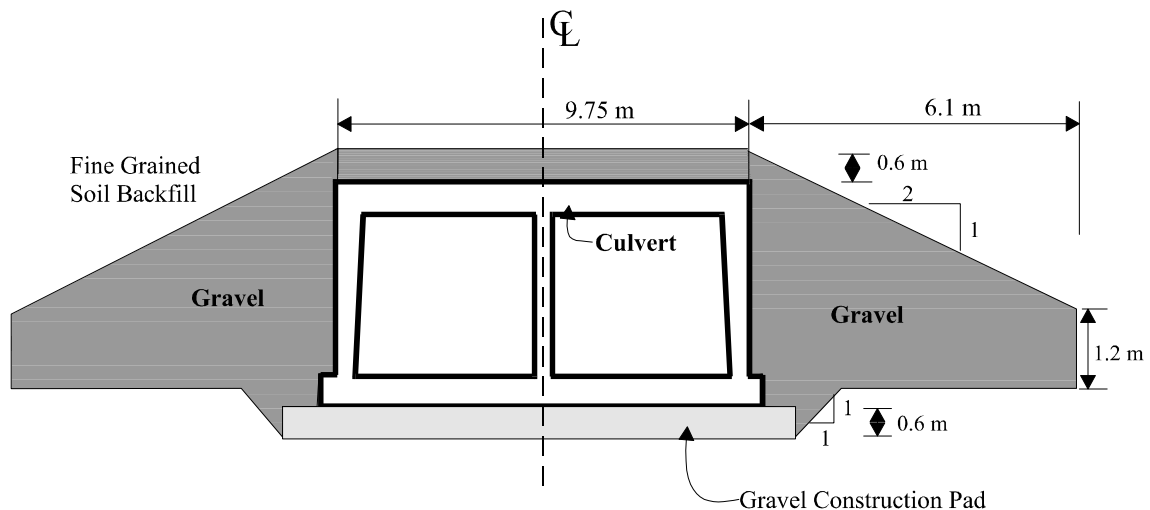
Schematic of Box Culvert with Typical Dimensions of Gravel Backfill Zone (Not to Scale)
